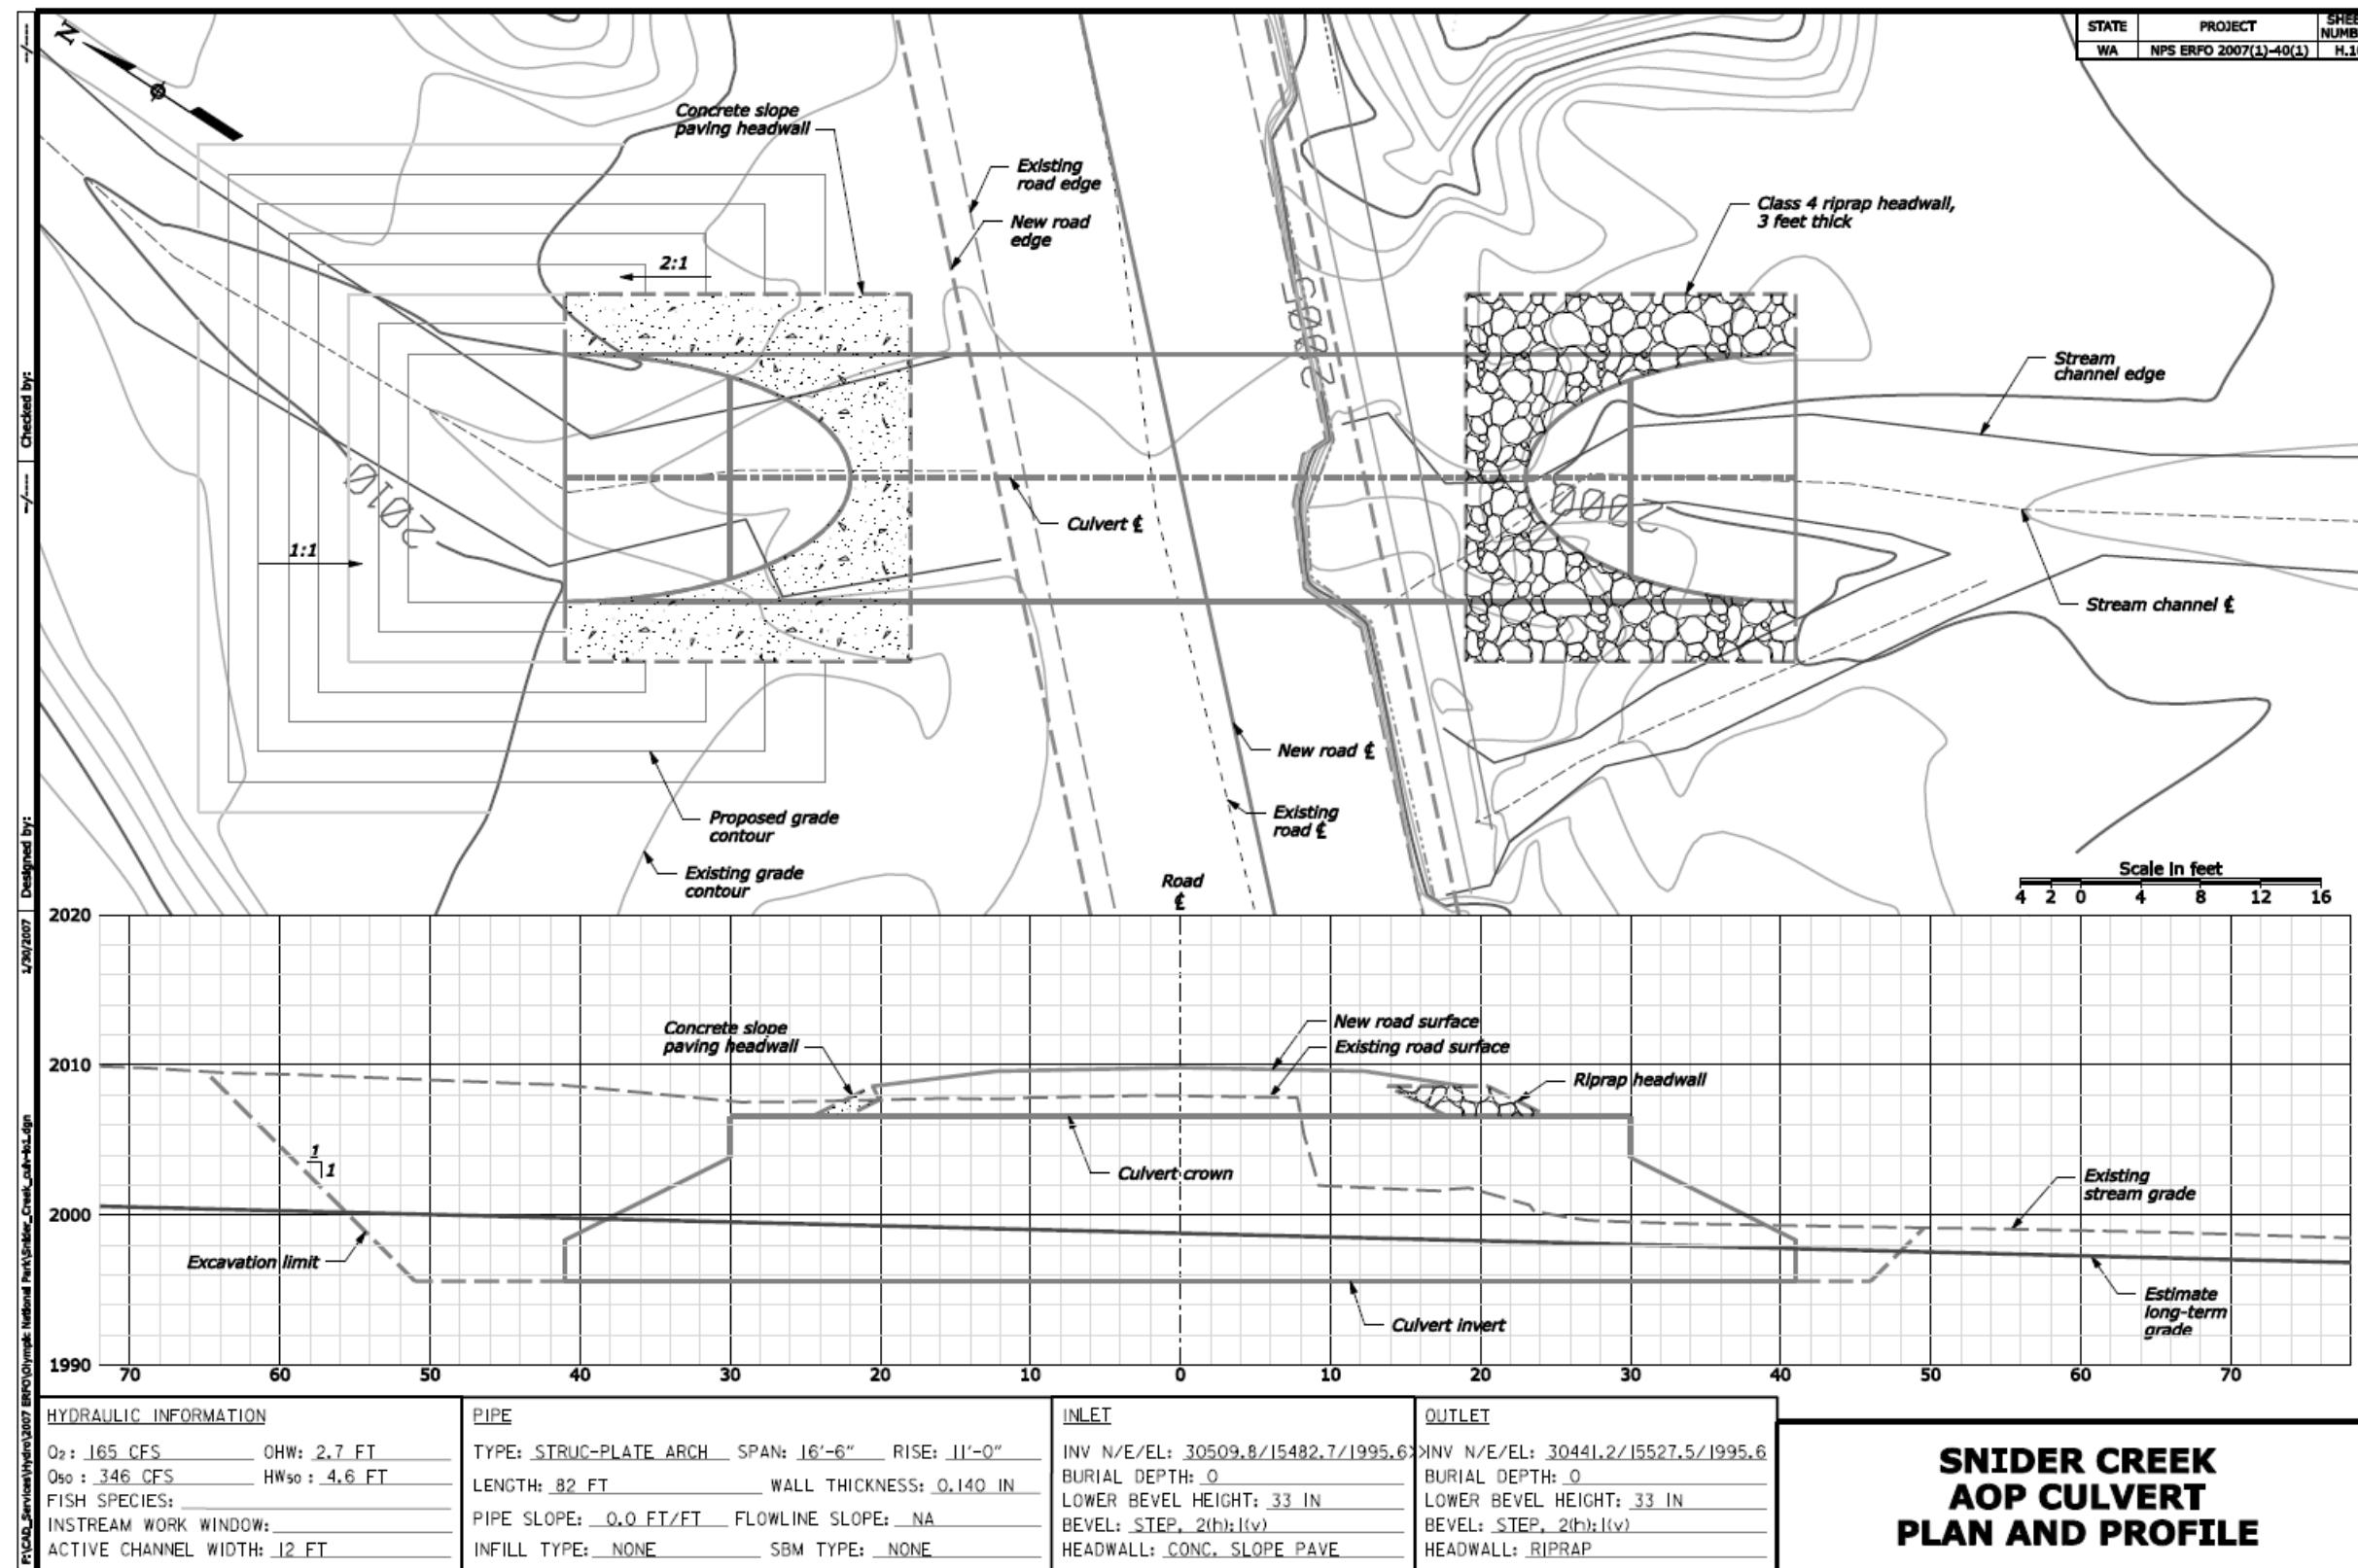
Snider Creek Culvert – Plan and profile sheet.
